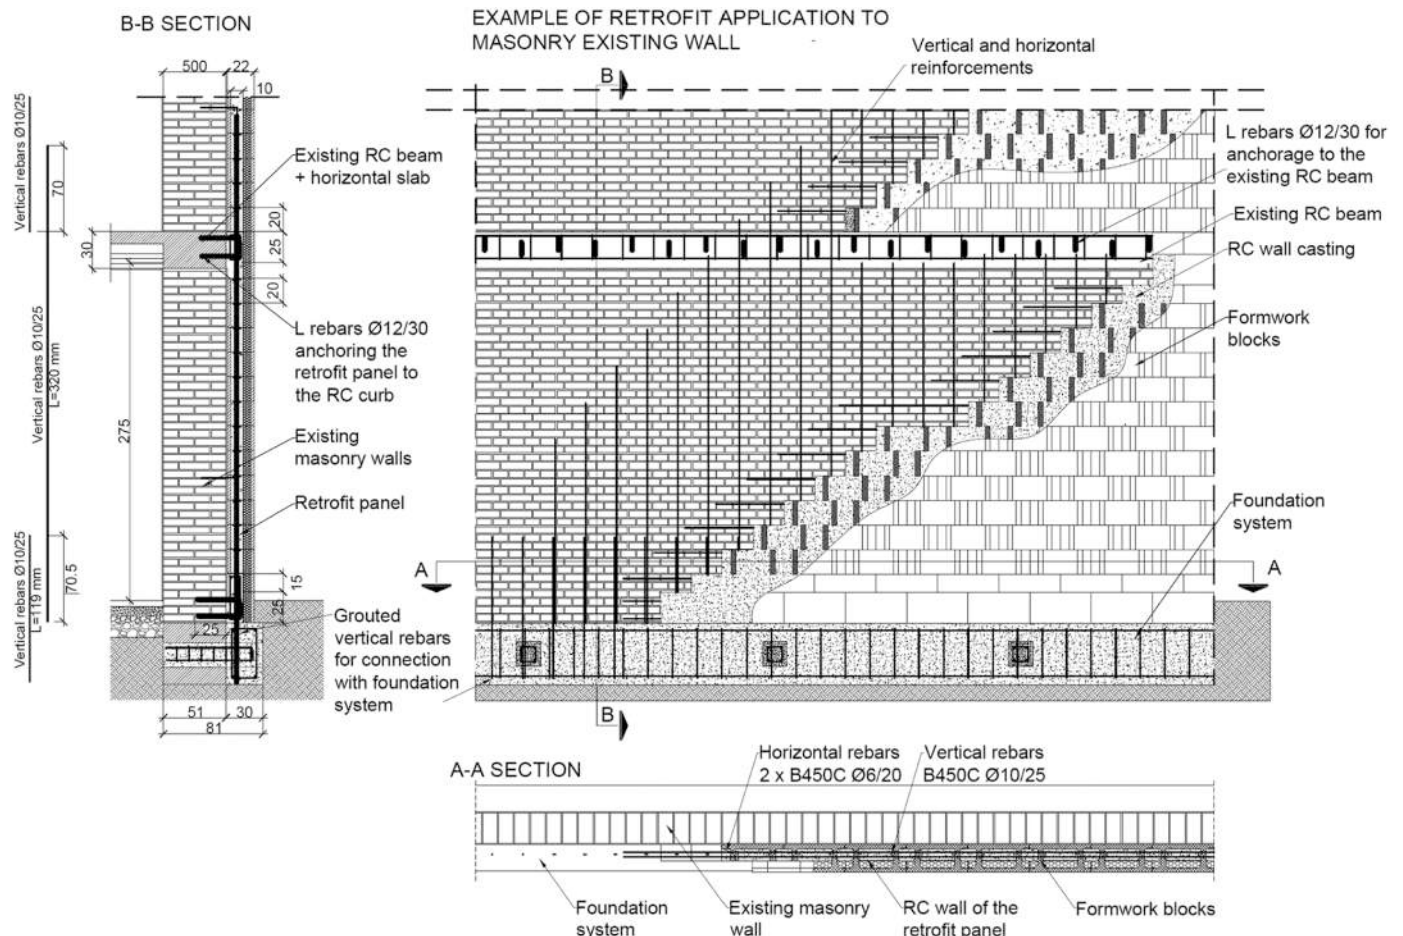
Example of application of the retrofit system to a masonry wall (standard reinforcement, vertical and horizontal).
